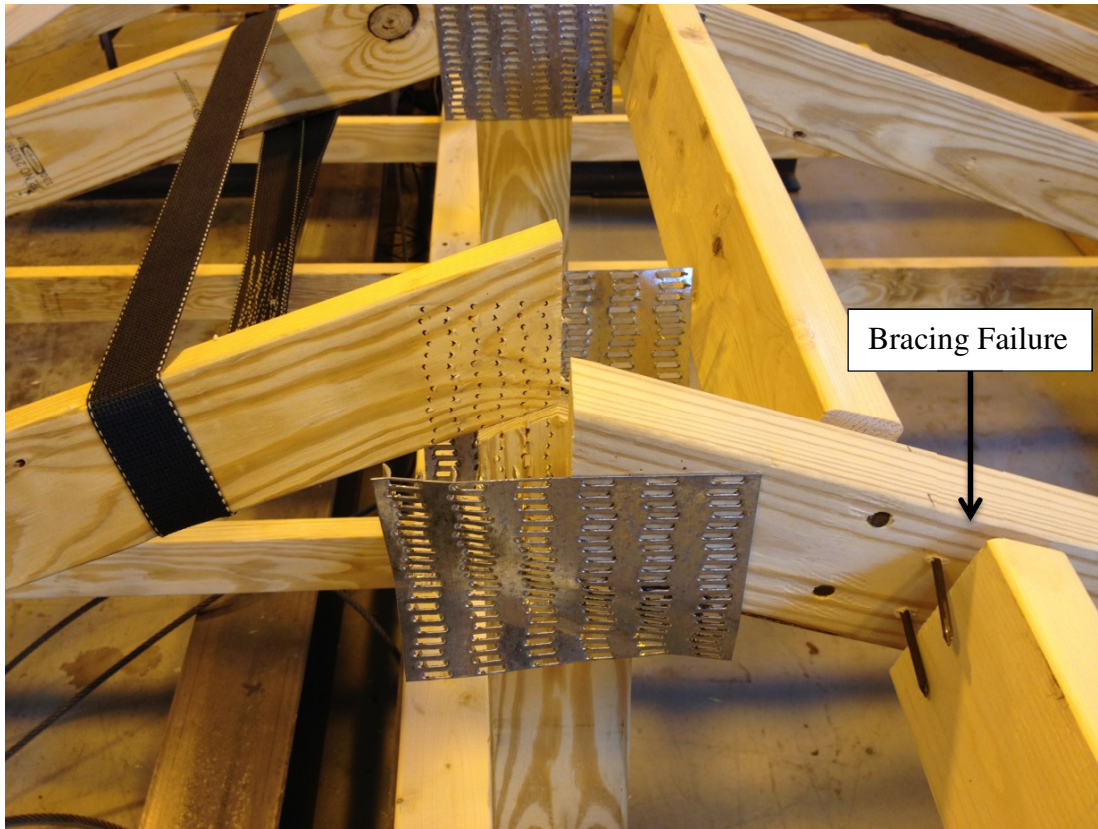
Failure in the peak truss plate located at the anchor point for strap and in-between bracing
